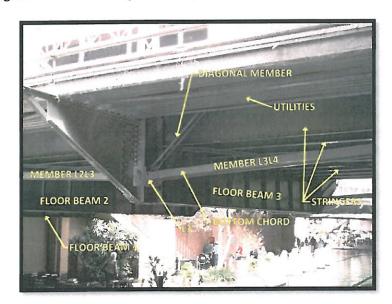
Truss Bottom Chords, Floor Beams and Stringers
